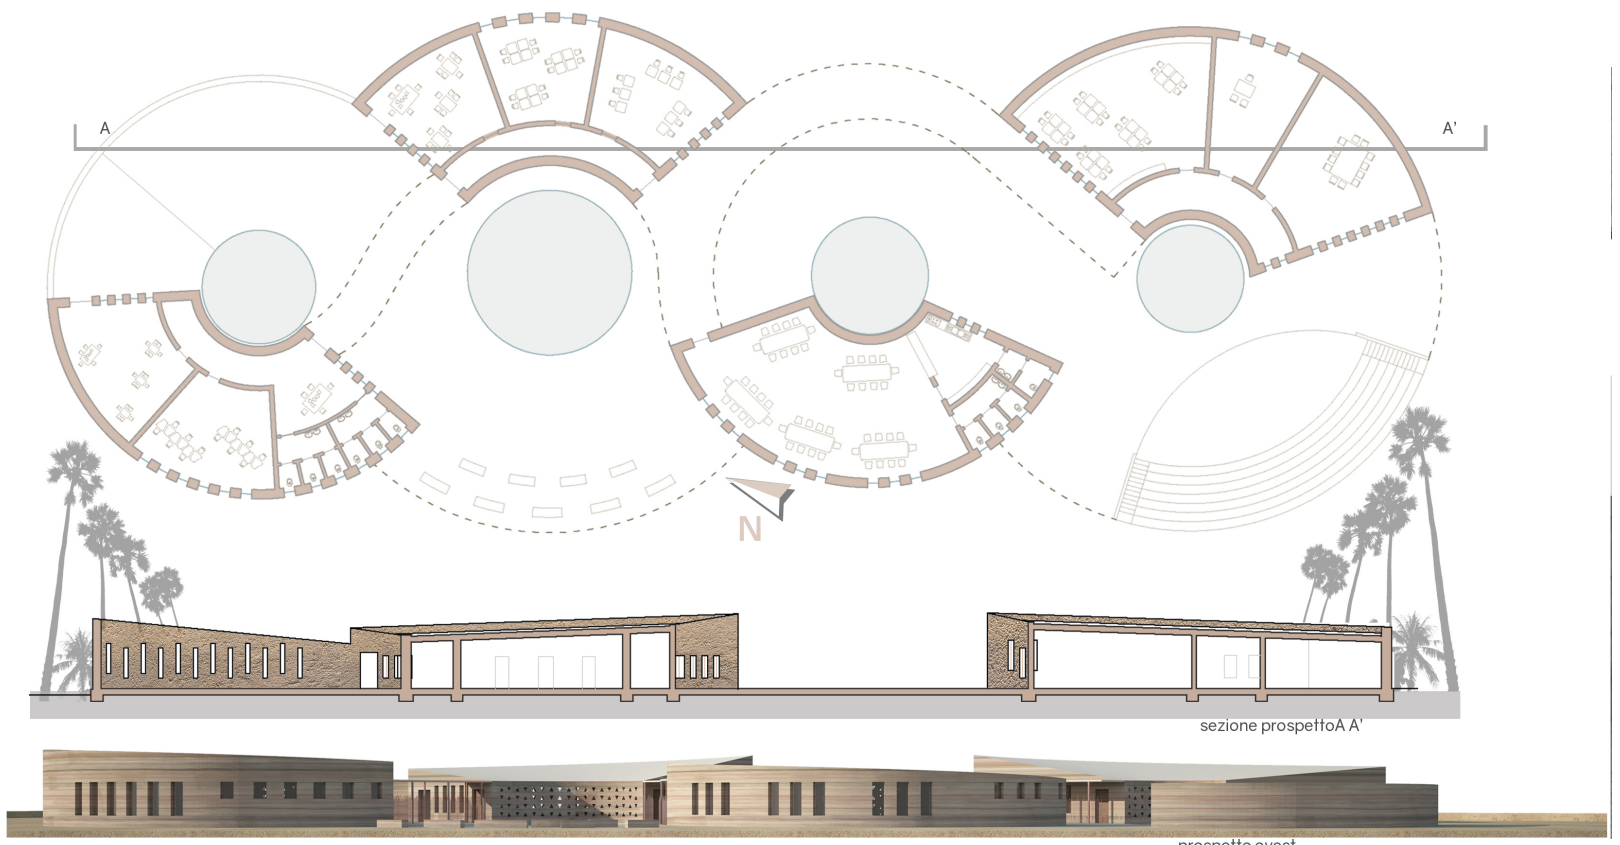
The rammed earth project for a women and children centre in Marrakech (arch. Daniela Petrone). Above: ground floor plan, below: facades.
